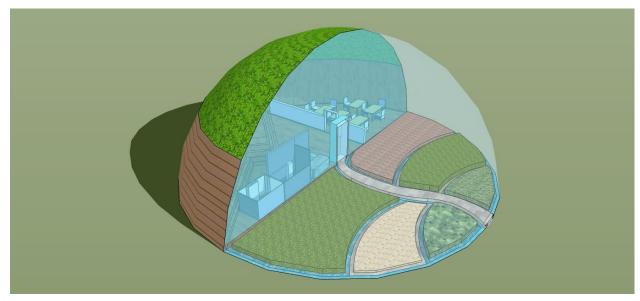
Proposed multi-purpose building, illustrating half greenhouse, half indoor events space
